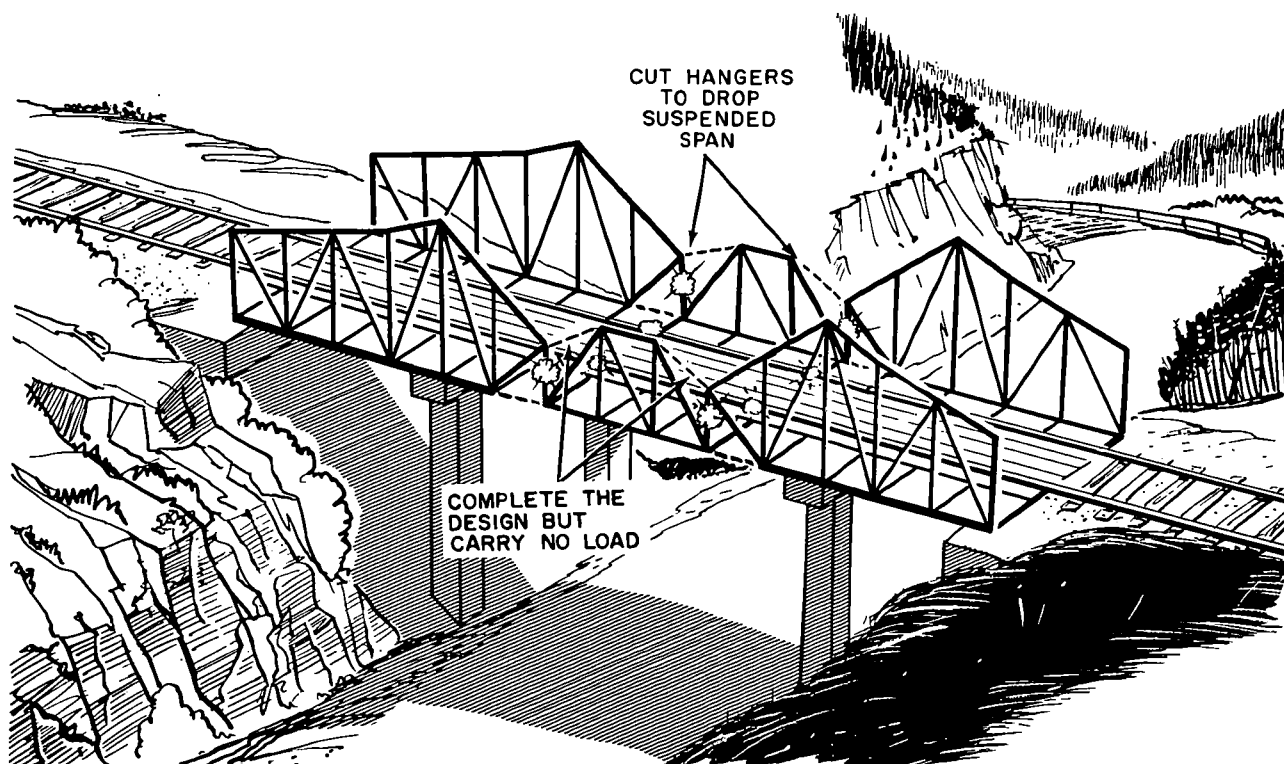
Partial destruction of cantilever truss with suspended span.
